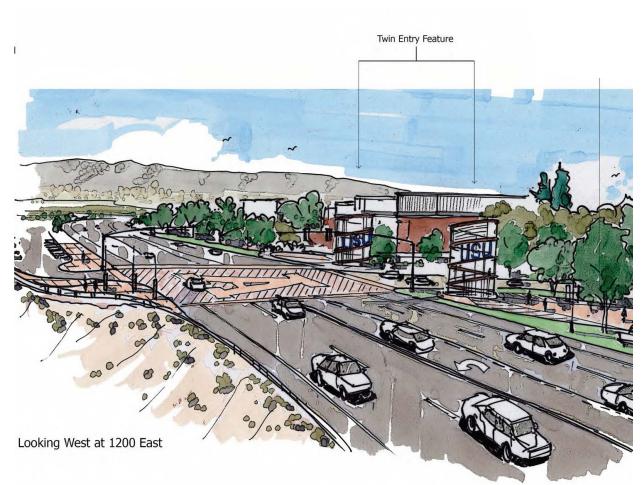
400 N CORRIDOR PLAN CUTSHEET
